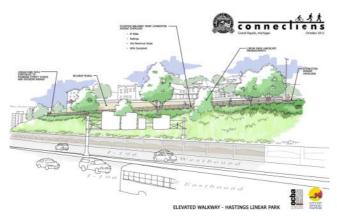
Elevated Walkway as an Extension of Hastings Linear Park
